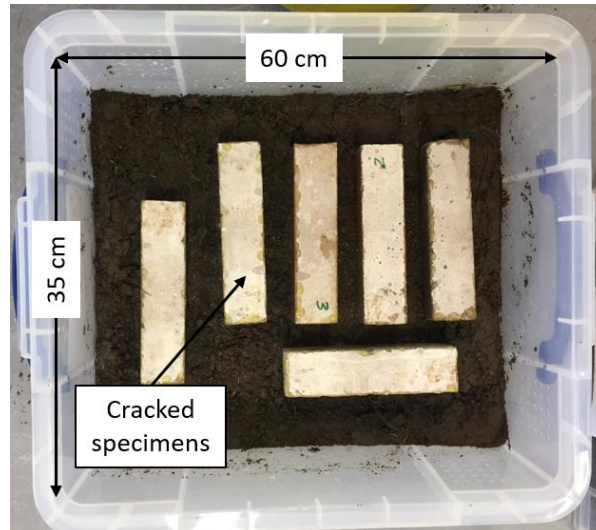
Incubation of cracked specimens within sterilized and non-sterilized natural soil
